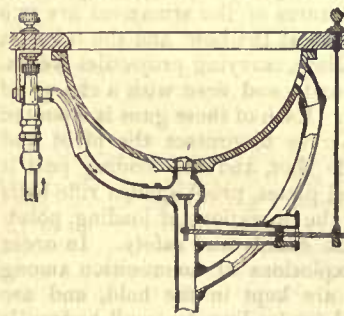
Valve-Outlet Basin with Outlet-Supply.
